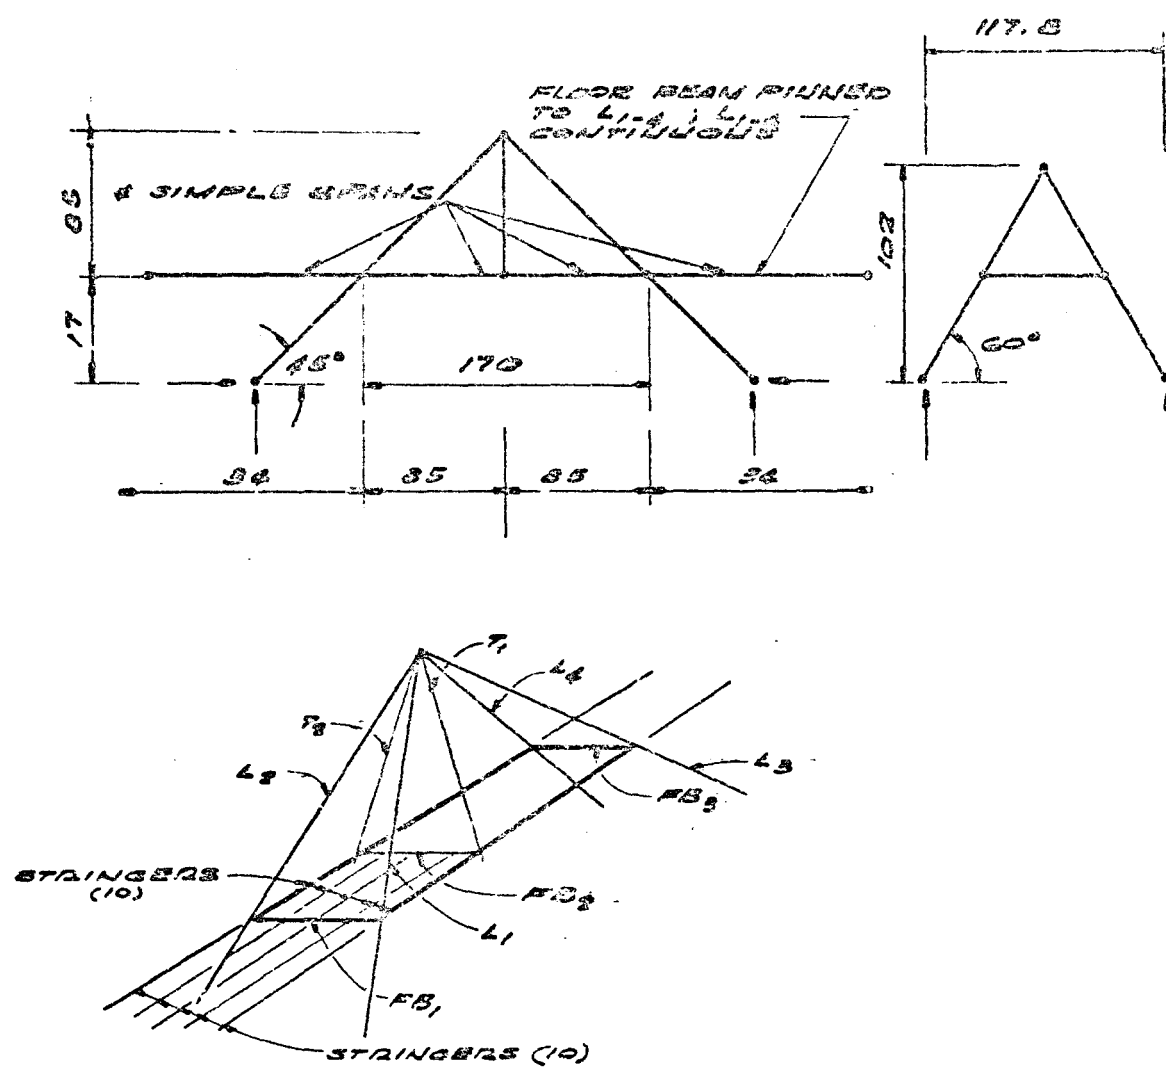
BRIDGE CONCEPT NO. 1: "A" FRAME
